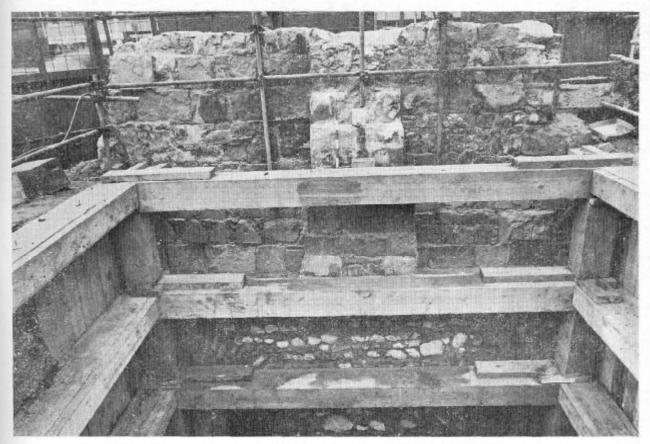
South facing view of the exterior church superstructure of the Wren building, overlying the Conventual Church foundation.
